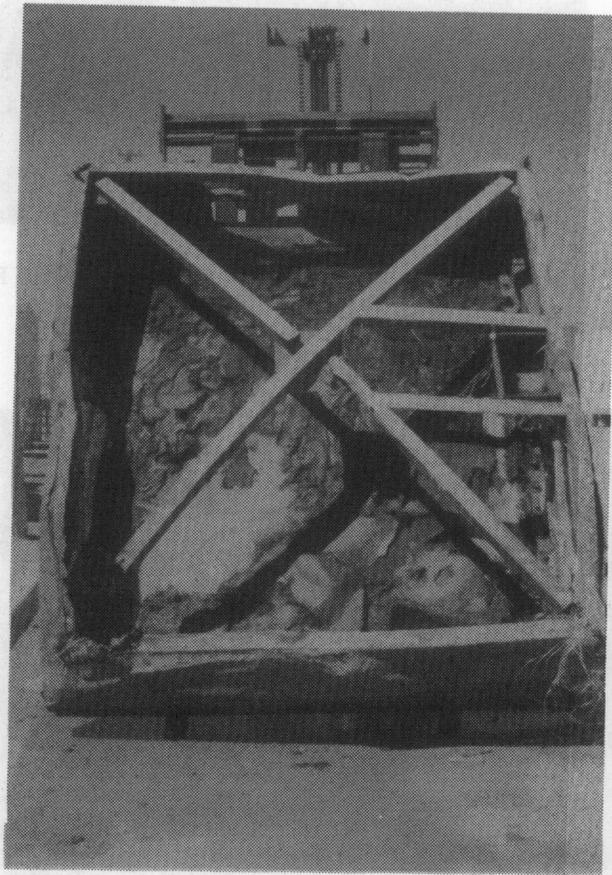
Front View of Outer Door, Post-test Condition of Kevlar
